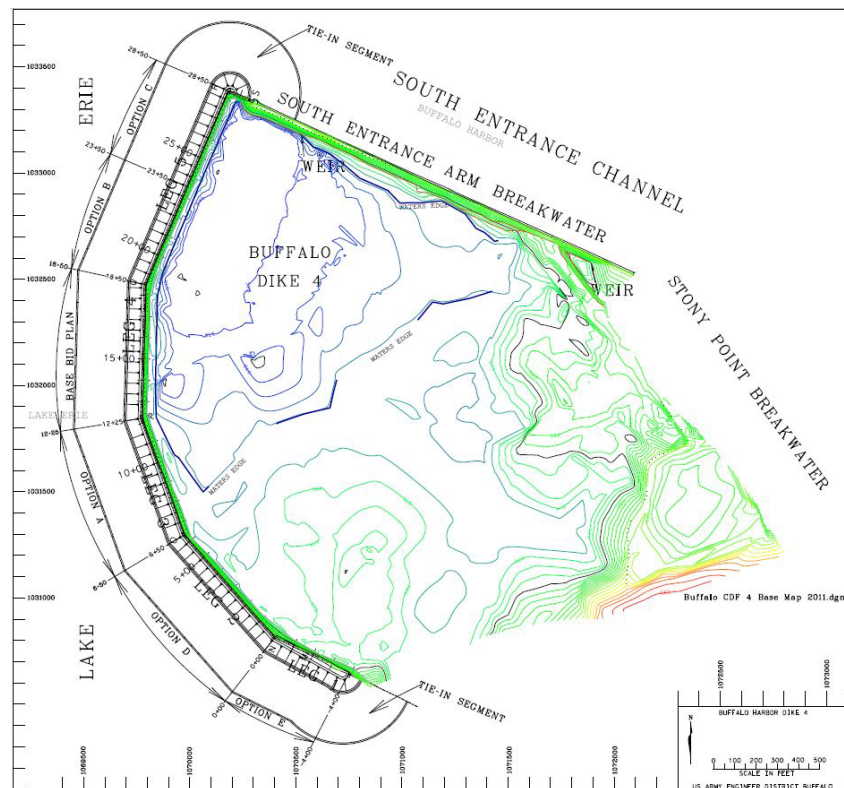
Proposed repair plan-view on existing Perimeter Dike.
